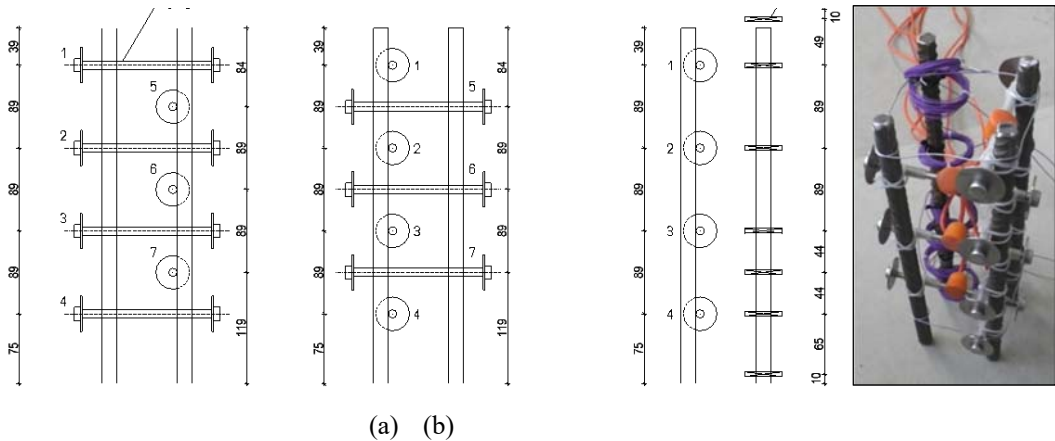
(a) Schematic layout of the sensors on a measuring column; (b) Setting of measuring column mounted to a reinforced concrete slab
